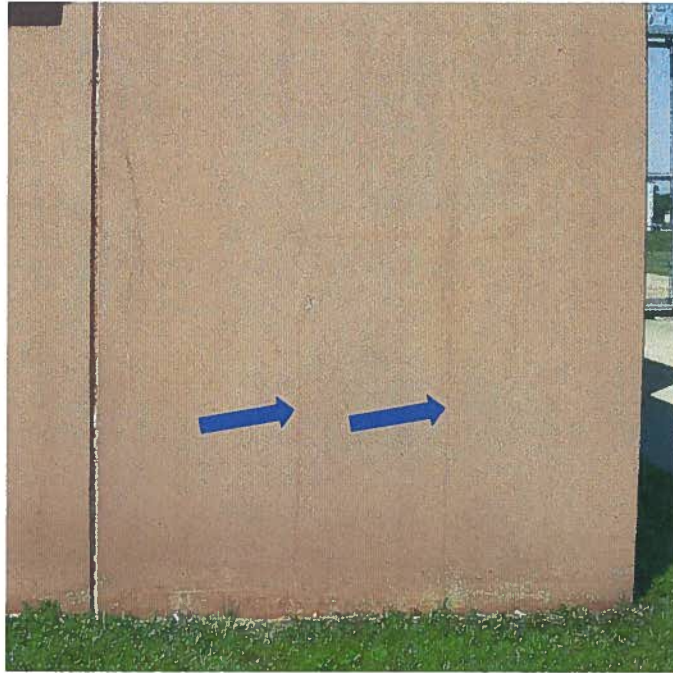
Vertical cracks aligned with prestressing strands (arrows; Brenner photo)
